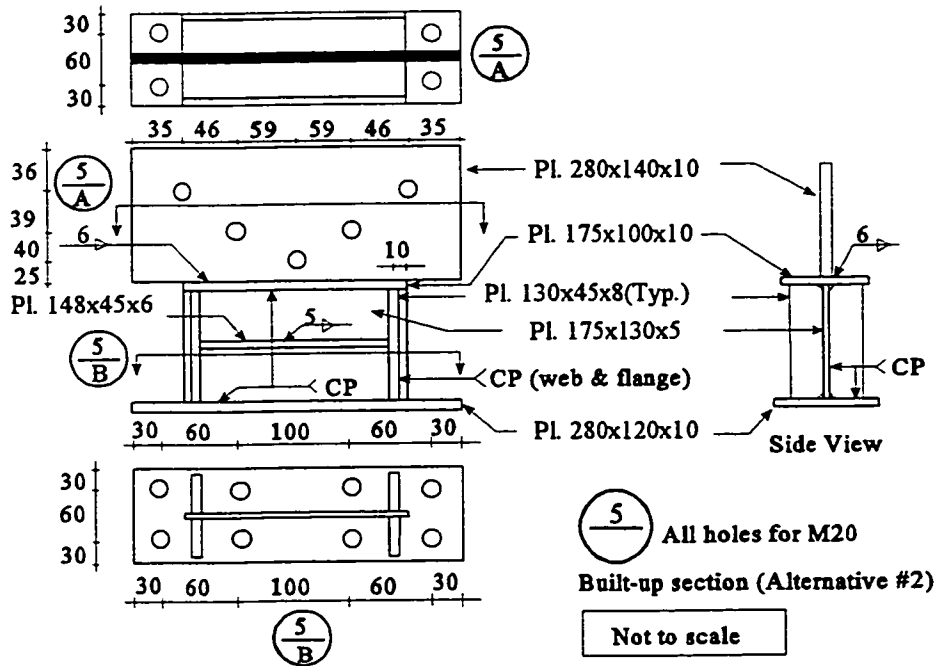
Details for the 2nd SPS alternative (bolted to the bottom beam).
